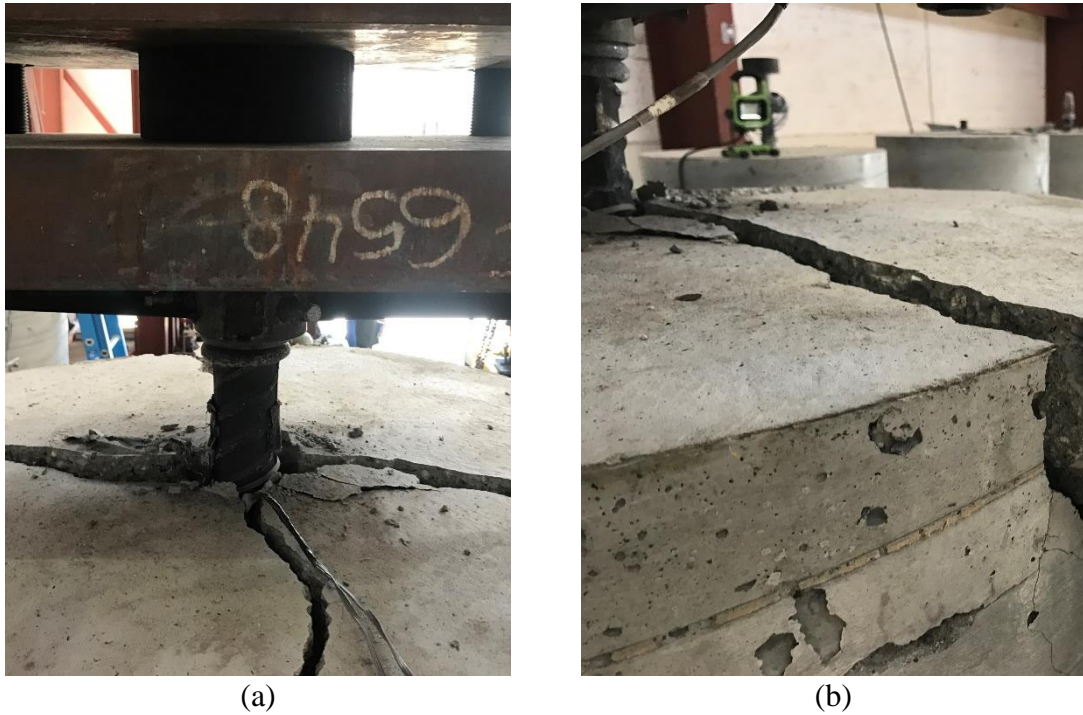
Bar Fracture Beneath the Concrete Surface in Specimen #3: (a) Damage at Top of Column; (b) Closeup View of Severe Splitting Cracks
